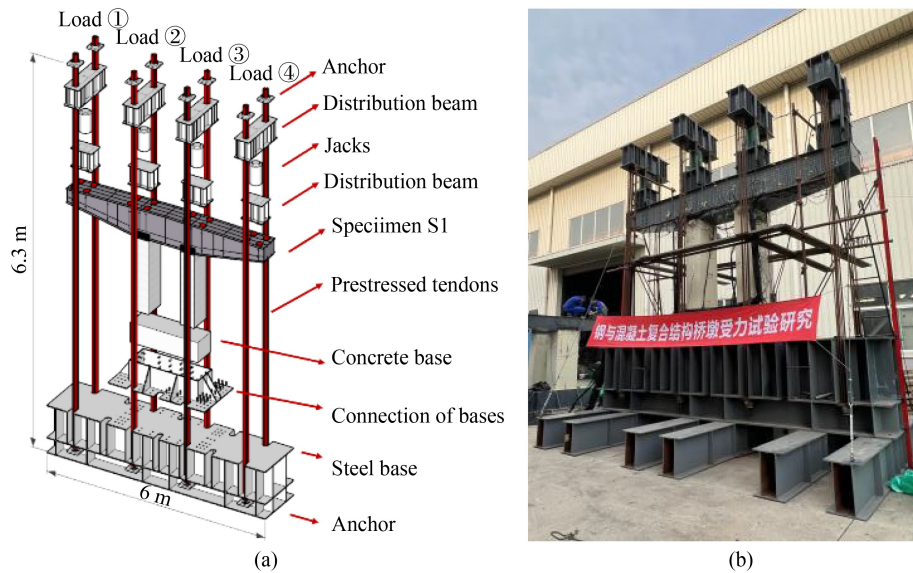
Loading system (specimen S1): (a) design; (b) on testing site.
